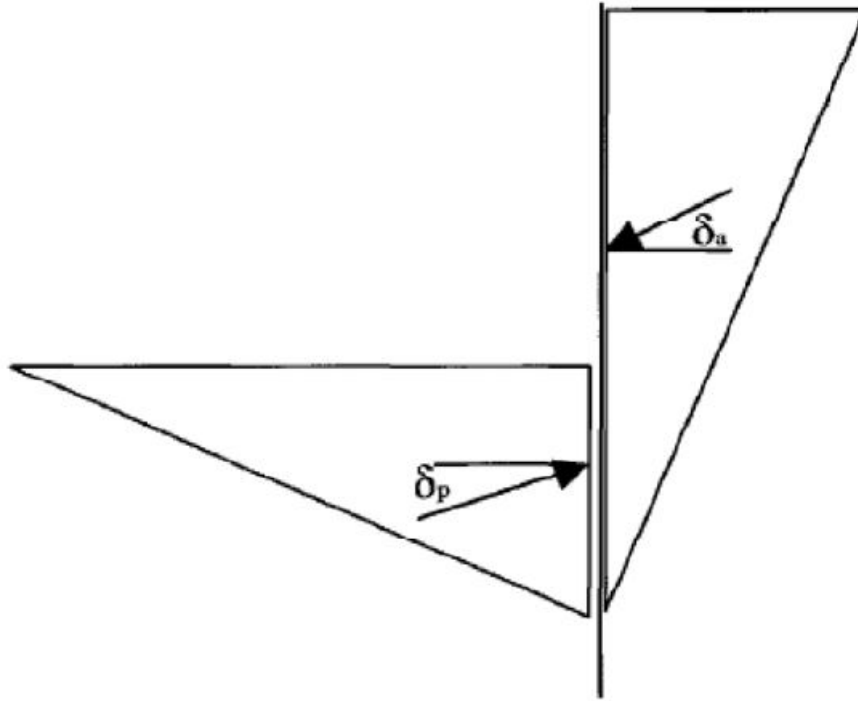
interaction between horizontal soil pressure and sheet pile (figure 5.1 from [5])
